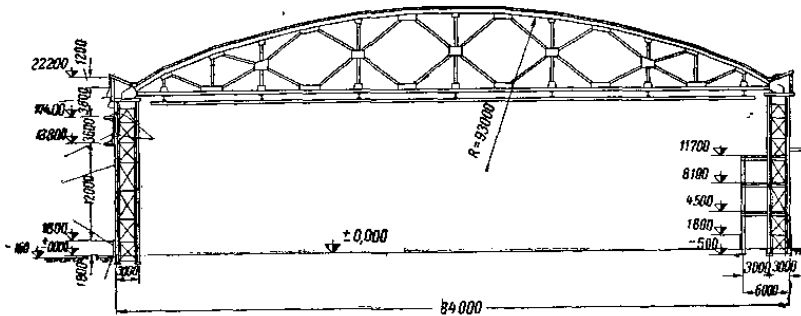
Cross section of the hangar with a span of 84 m with prestressed trusses (dimensions in mm)
